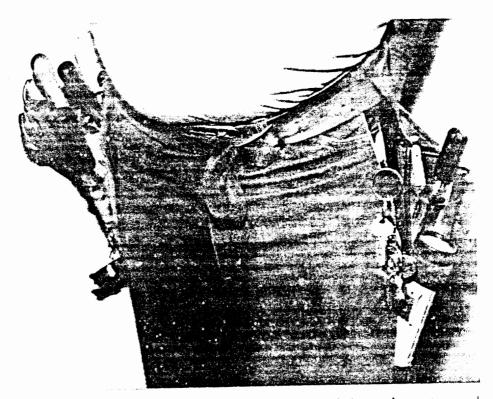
Standard electrician's tool belt with equipment pouches on both sides.
